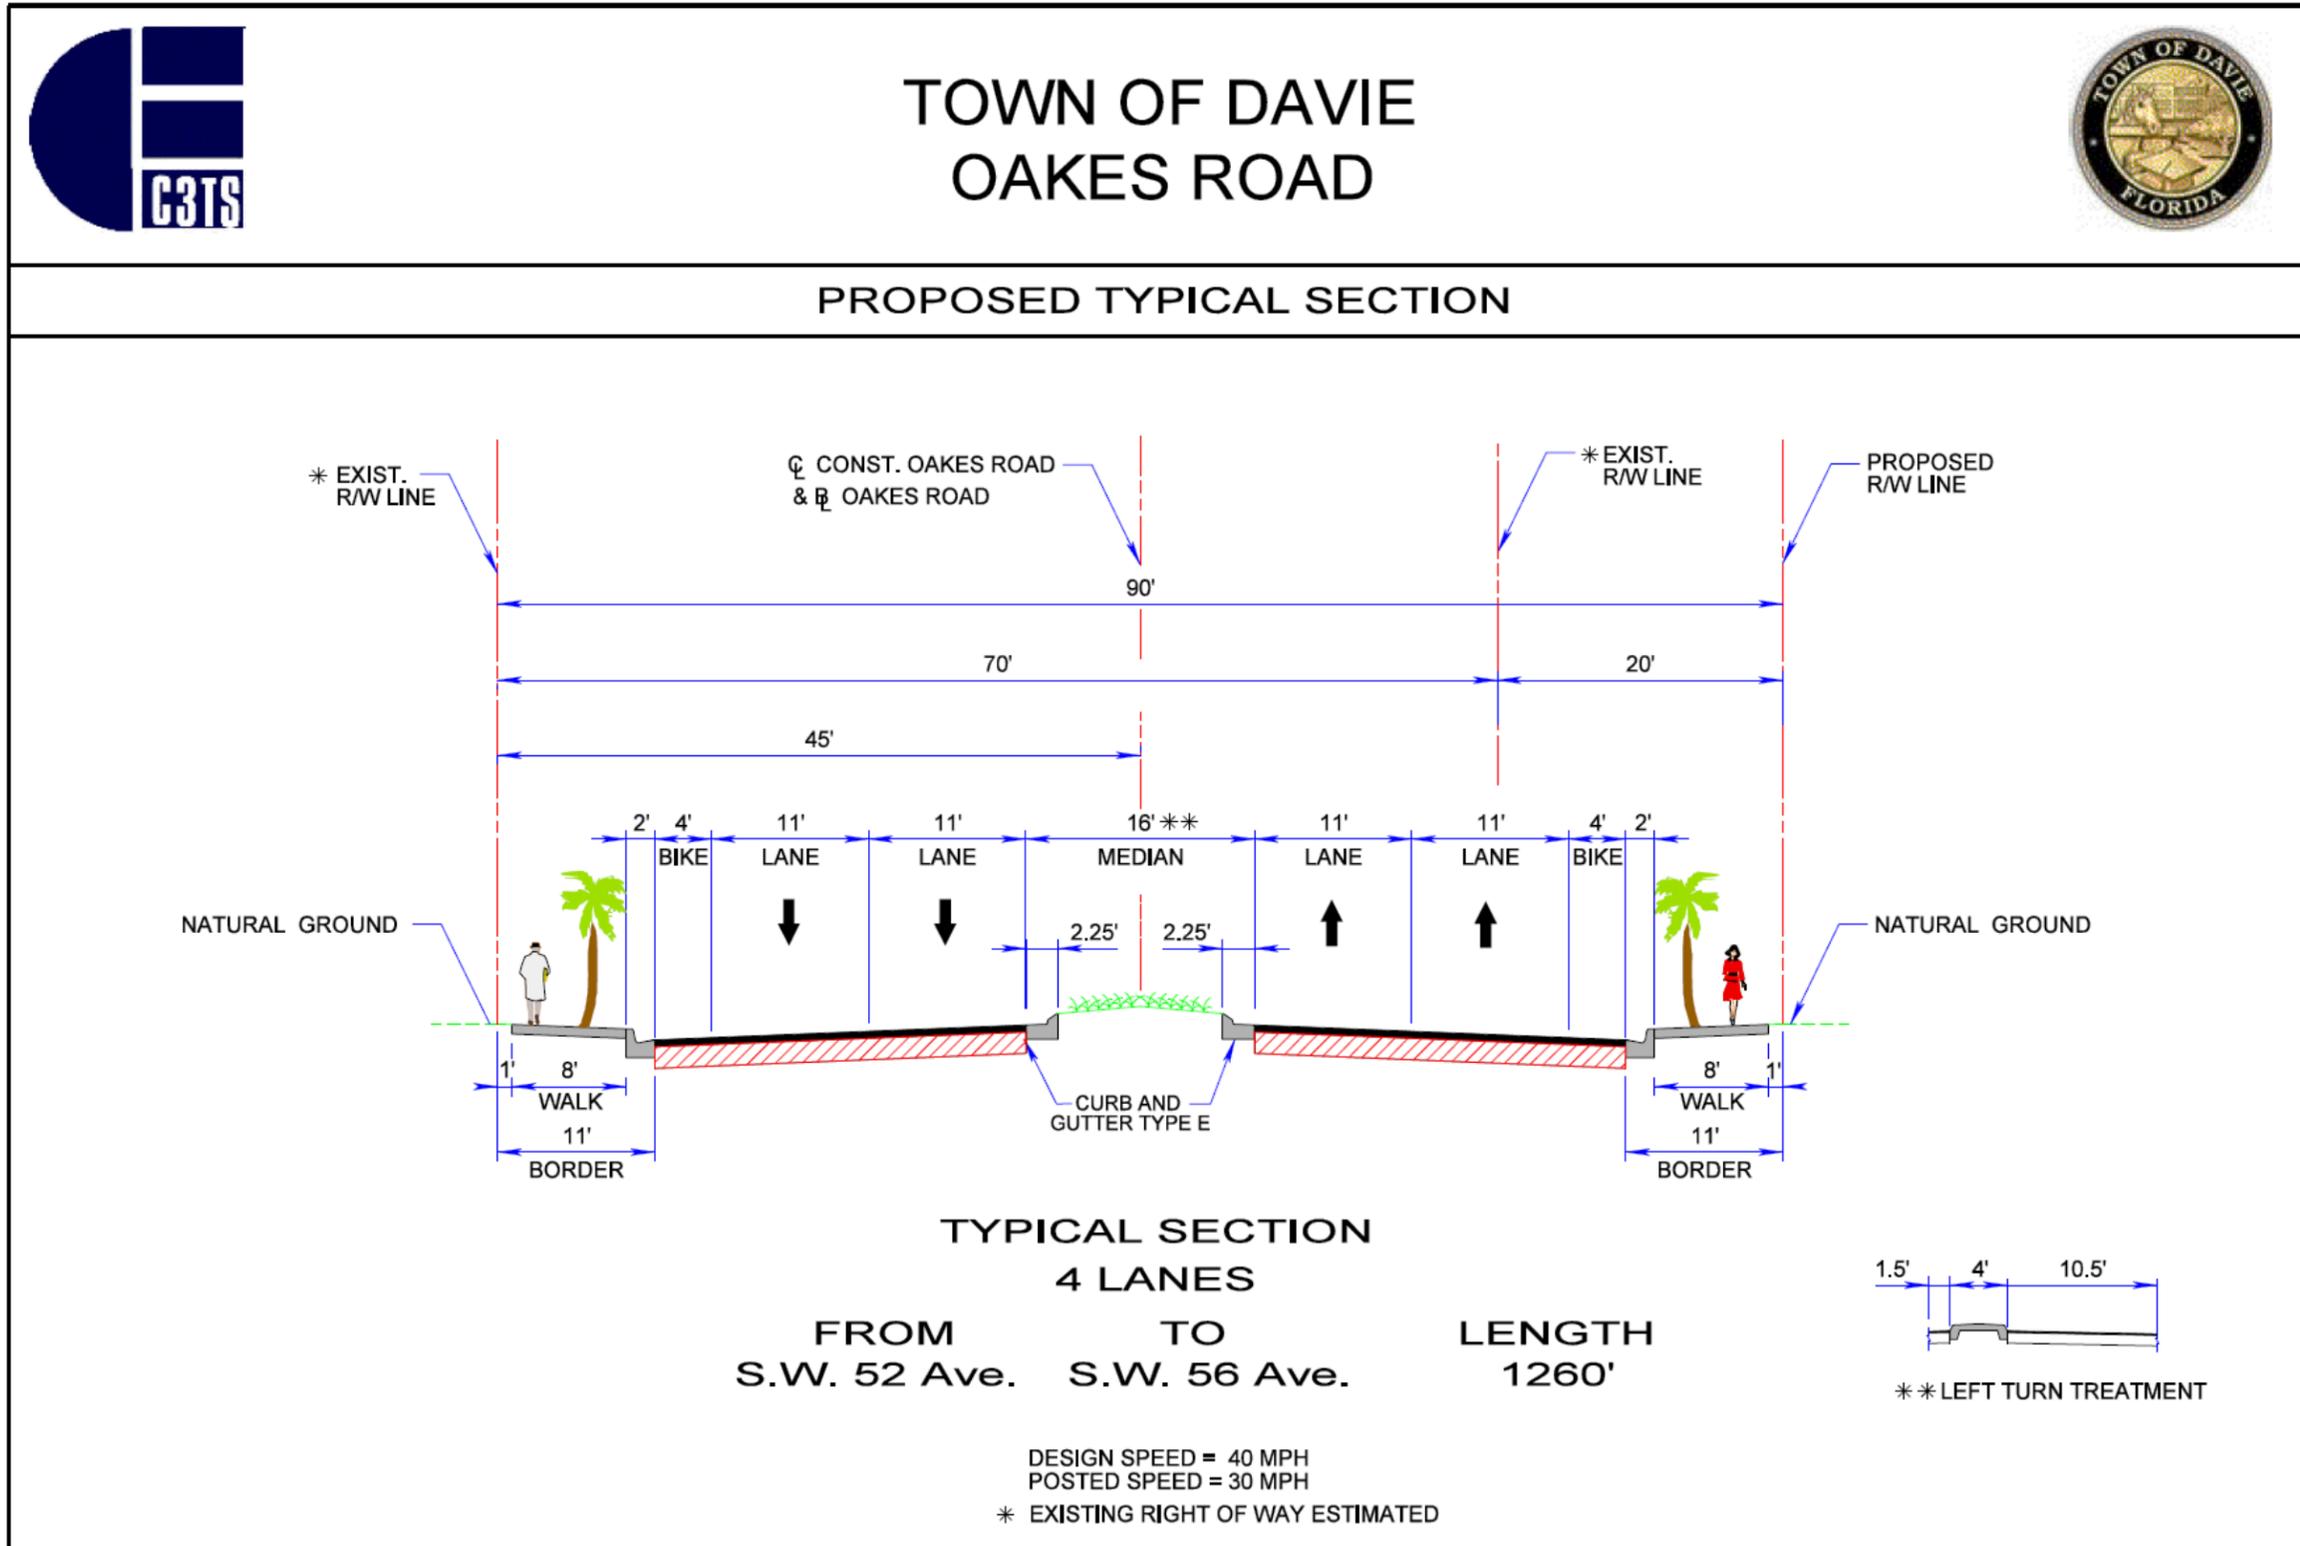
; Oakes Road Typical Section From SW 52 Ave To 56 Ave
